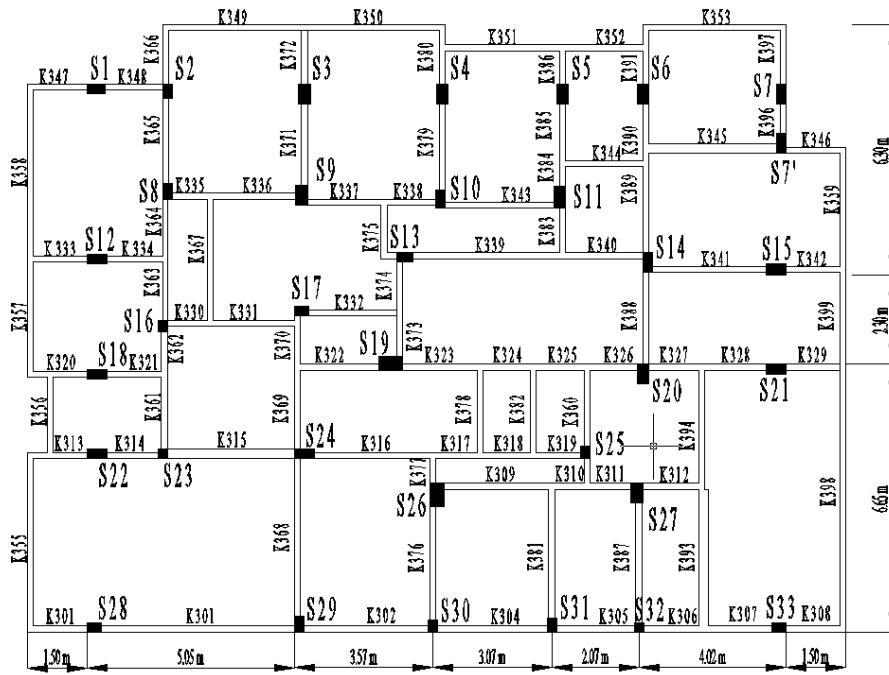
Typical floor plan of the building analysed by Ilki et. al (2005) before and after retrofitting the columns with FRP wrapping
